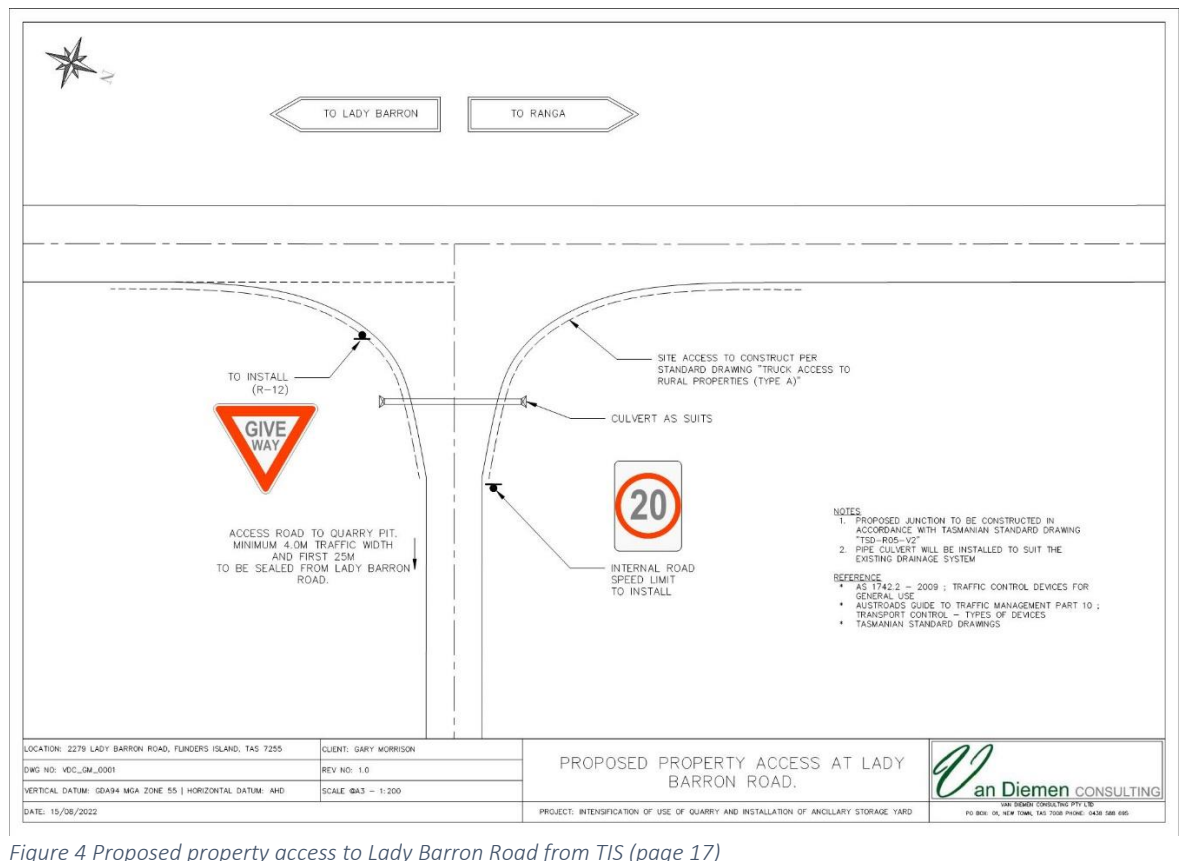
Proposed property access to Lady Barron Road from TIS (page 17)
